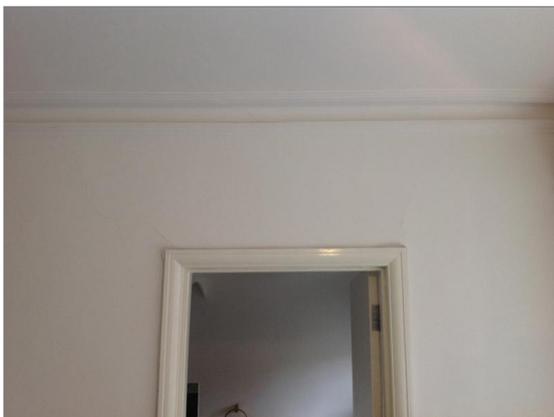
Minor cracking to wall at corner of door frame in 1st floor bedroom
